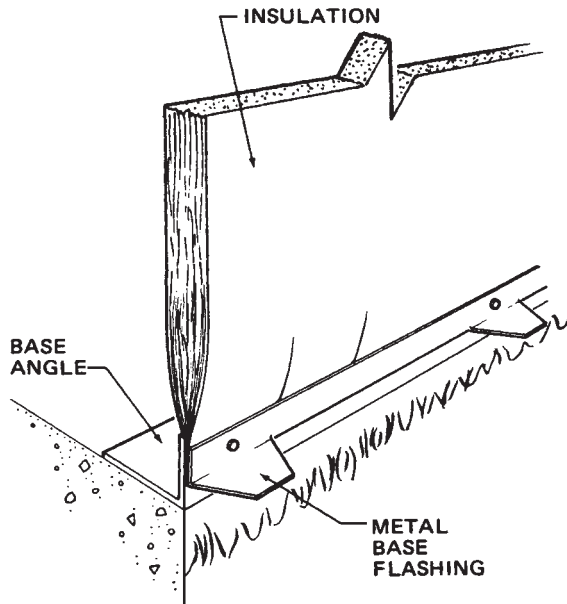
Metal base flashing fits the wall panel profile. (Butler Manufacturing Co.)
